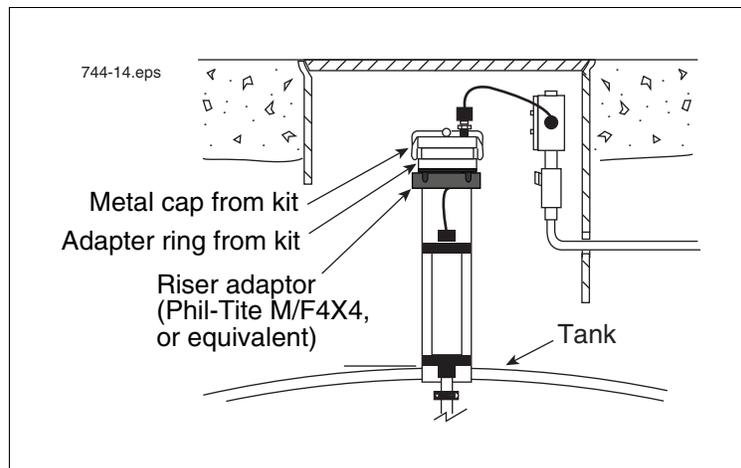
Installing a riser adaptor beneath the metal cap and adapter ring
